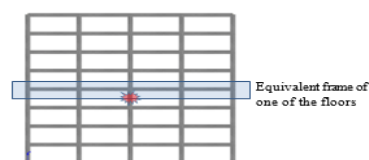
Structural framing of the building and equivalent frame highlighted for one of the floors.
